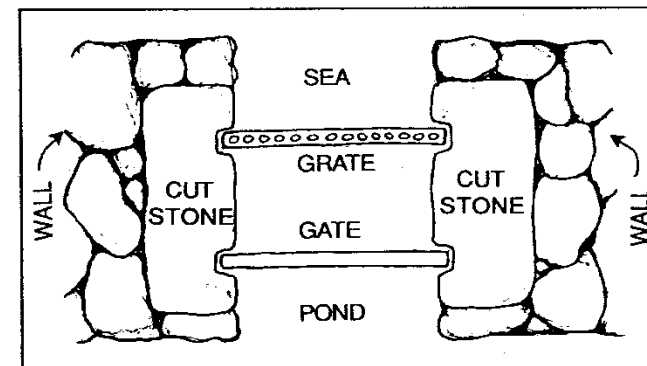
Drawing of typical mākāhā area in fishpond wall. (Modified from Kelly, 1975)
